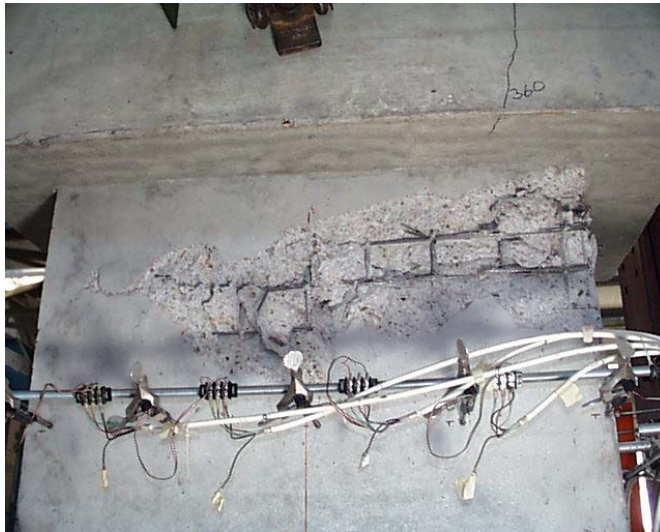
Specimen P10: Photo of East Wall at End of Test
